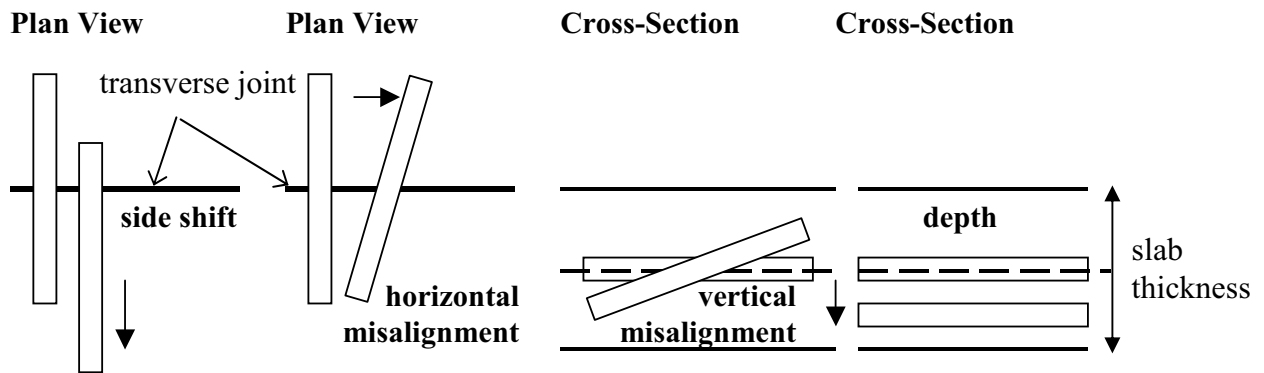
Types of misalignment of dowel bars in concrete pavement.
